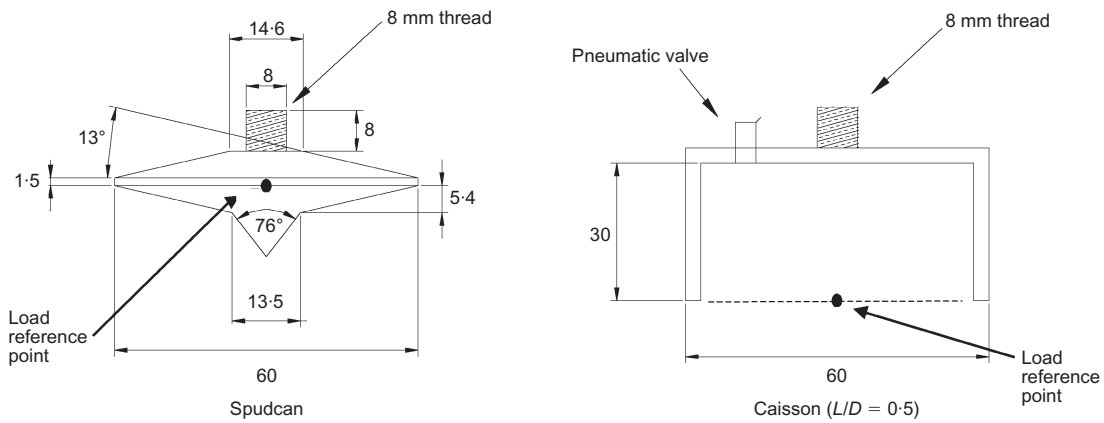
Model spudcan and caisson footings used in experiments (all dimensions in mm)
